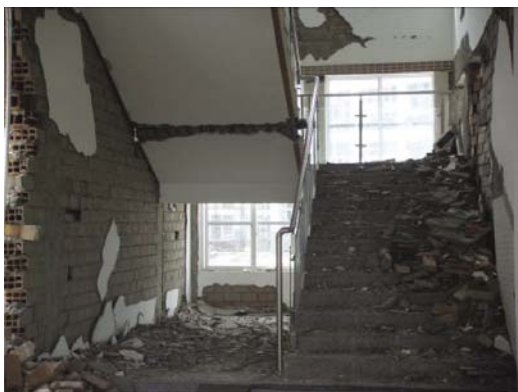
Damaged stair shaft of school building in Dujiangyan (VII/(VIII-IX))
